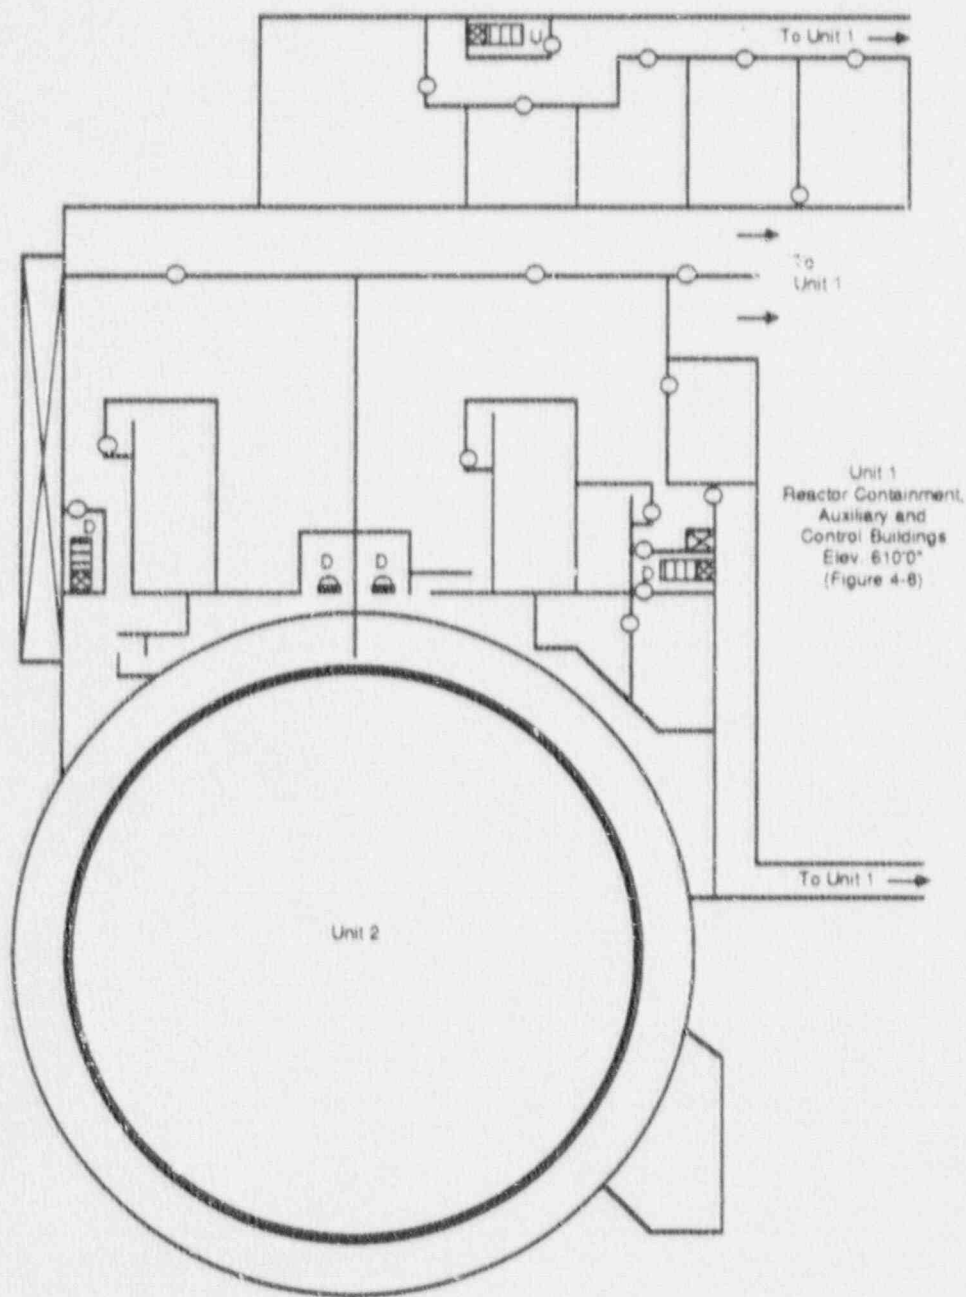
Bellefonte 2 Reactor Containment, Auxiliary and Control Buildings, Elevation 610'-0"
